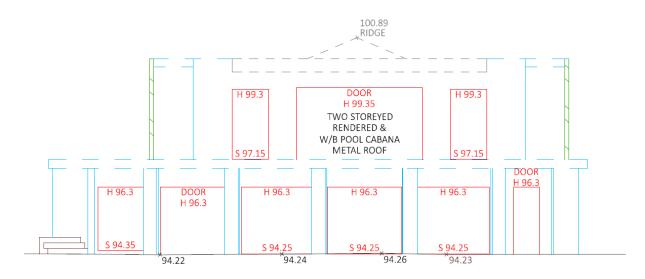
Site survey plan of the pool house (Source: ESA Surveys)
